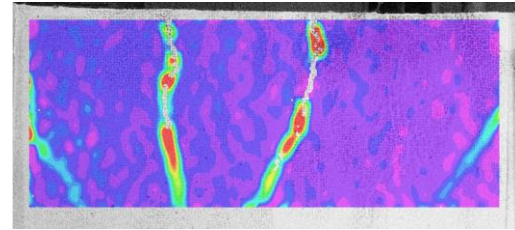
shows the test results of the steel specimen after loading the specimen up to a displacement of 0.5 in. The concrete started to crack at the C1-1 and C1-2 locations at a load level of 2.7 kips. By loading 2.7 kips to 2.9 kips, the crack passed through the second stirrup (located at 4 in. from the end face), elongating to 8.75 in. at the end of the experiment with 9 kips of loading. Although the FEA showed the first cracking possibility in the C2-1 and C2-2 strain gauge locations, it was the second position for cracking at a load level of 3.6 kips. At 3.6 kips to 3.7 kips, it cracked right away through the second stirrup and terminated at the crack length of 7.75 in. The reason for C1 location cracking, compared to C2, is under research. DIC analysis was capable of visualizing the cracking pattern in each loading step. This experiment was the initiative for a simplified experimental setup. As shown by the test results, rotating the specimen and applying vertical loads introduced similar behavior as a prestress transfer, demonstrating the study concept.
